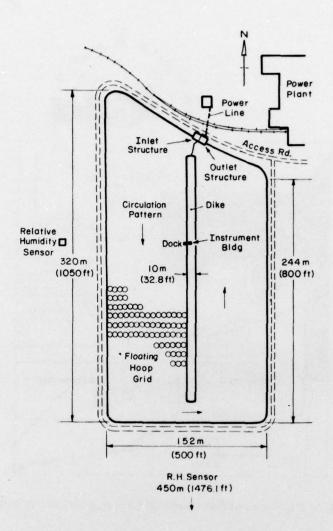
Layout of Fort Wainwright power plant cooling pond.
